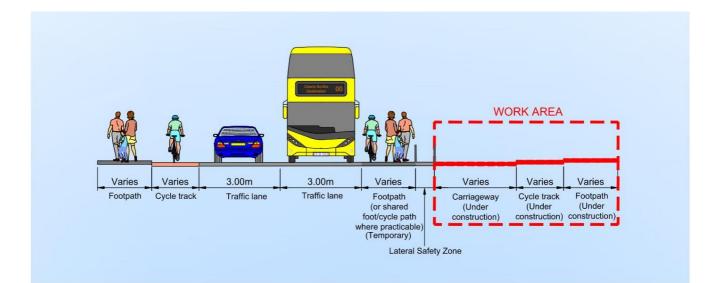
Traffic Management Cross Section, Section 4b - Stage 1
